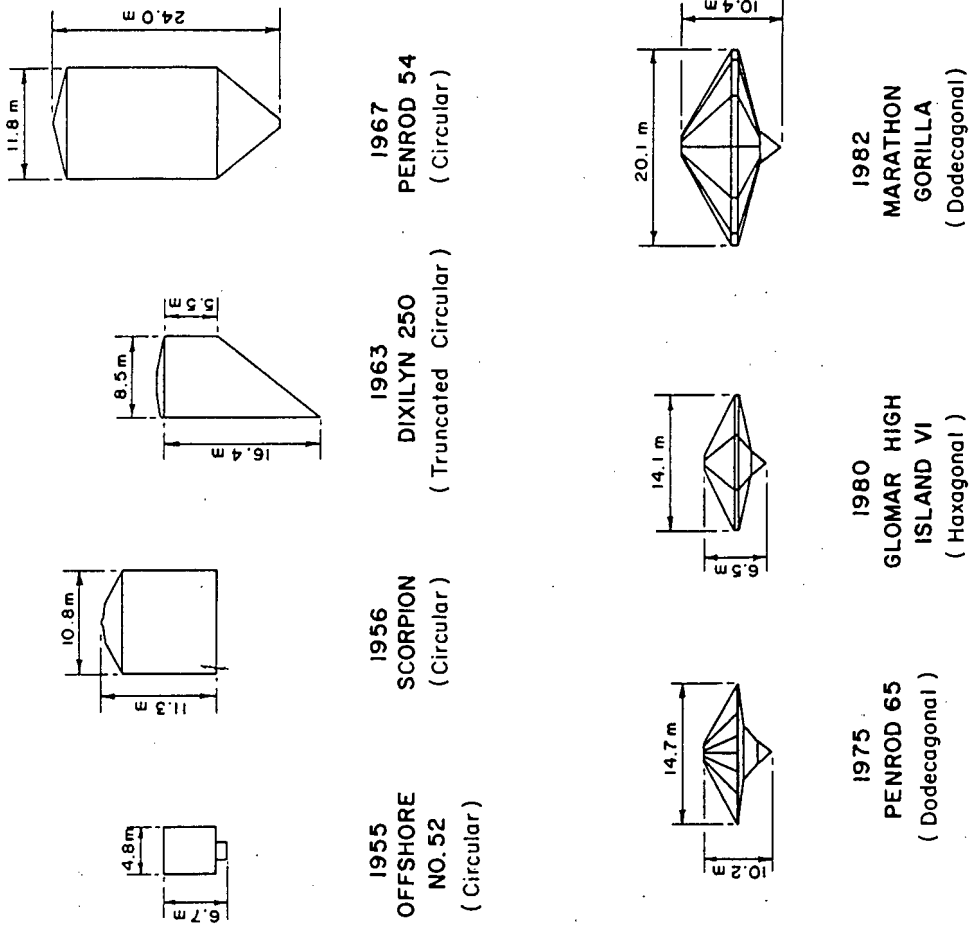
Typical dimensions of jack-up drilling rig footings (after McClelland et al, 1982)
